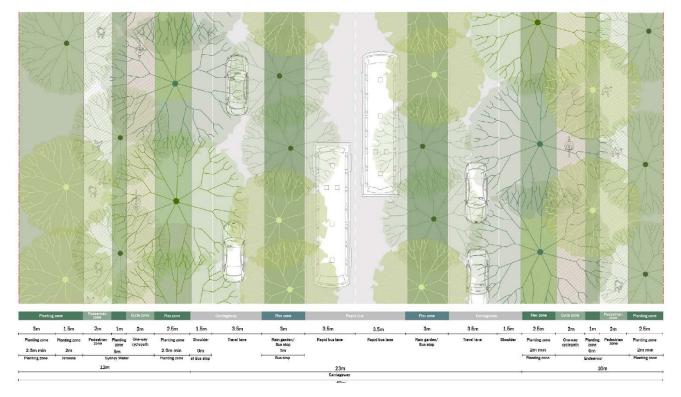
Primary Arterial Road (Rapid Bus) – Typical arrangement
